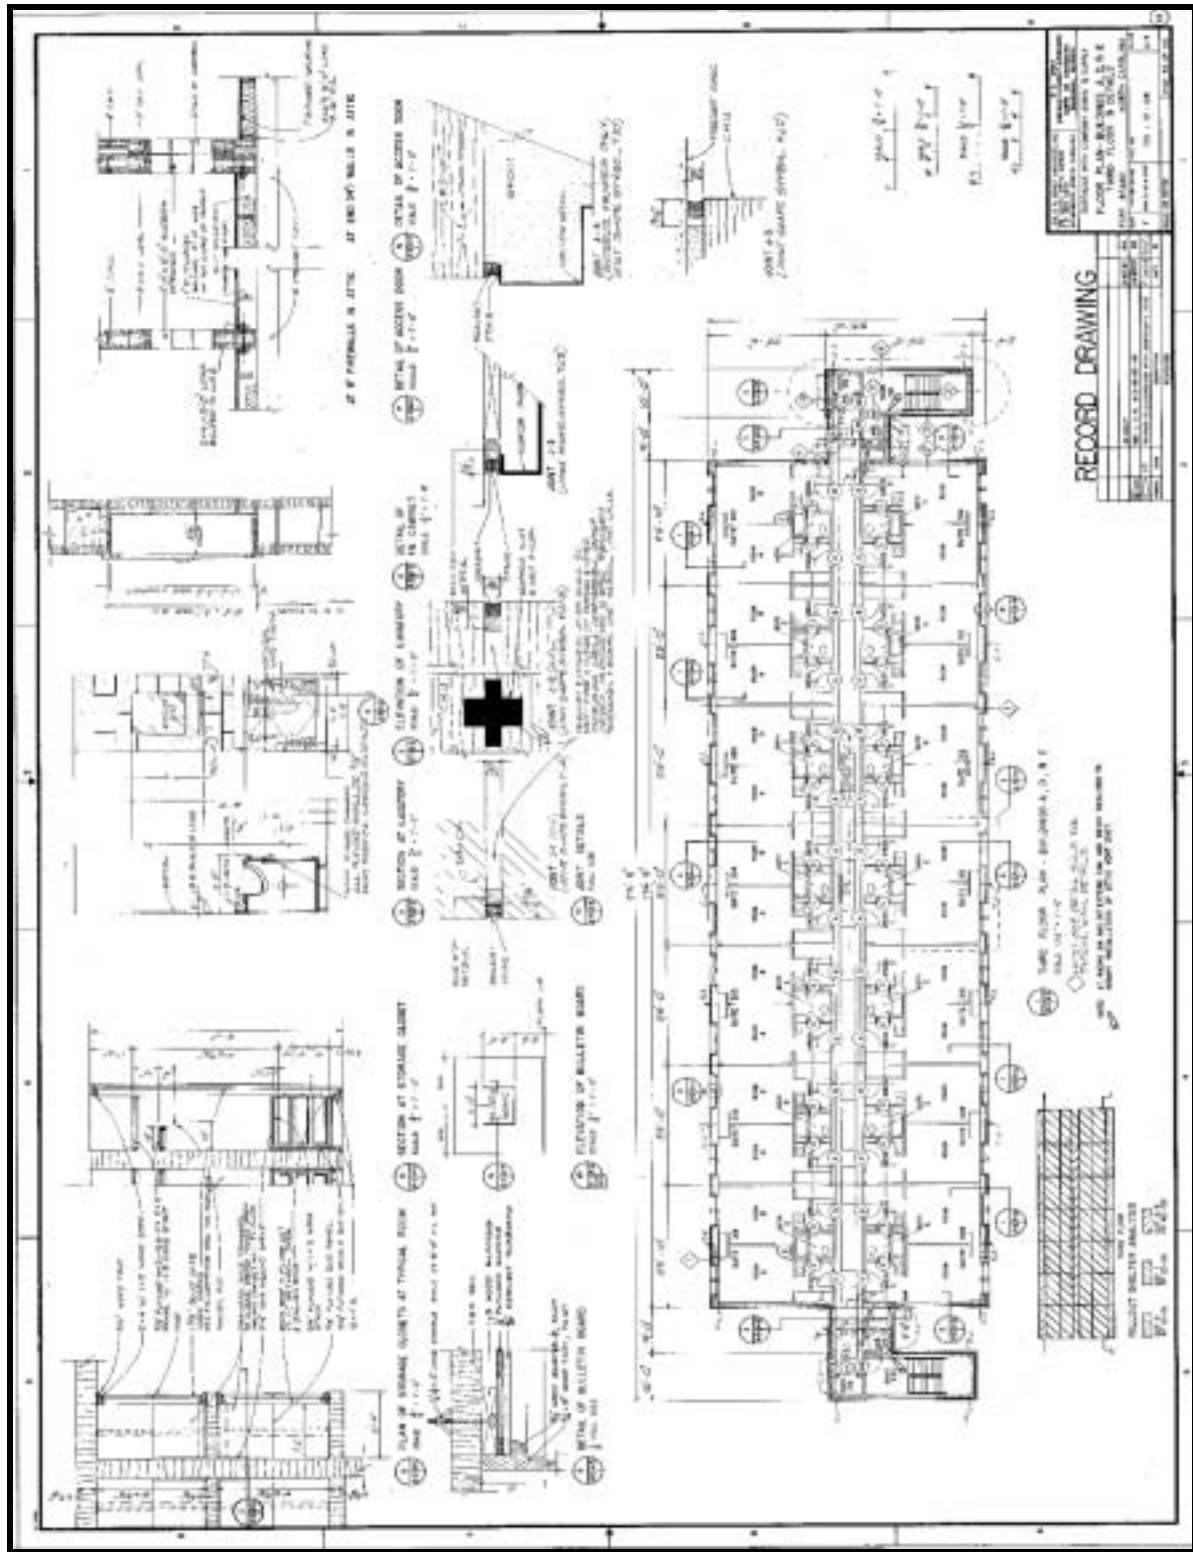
Quadrangle barracks, third floor plan and details, Ft. Bragg (1985, revised 1987) (Engineering, Ft. Bragg).
